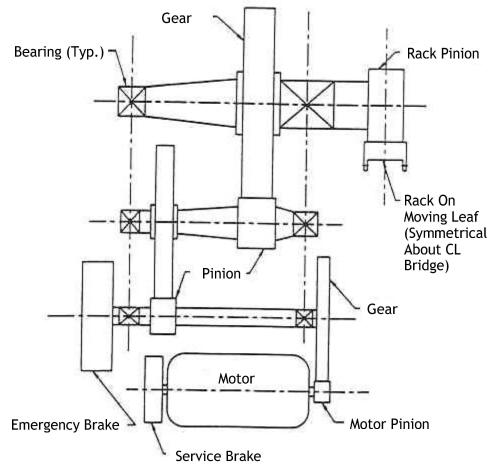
Trunnion Bascule Bridge Machinery (One Quarter Shown) is Located Outside of the Bascule Trusses on the Pier
